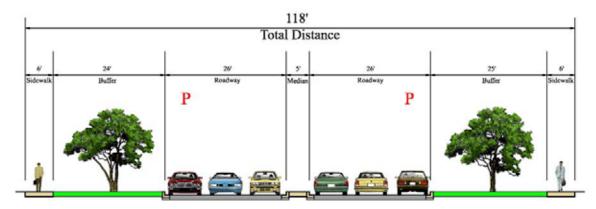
Charles Street/St Paul Street, between Stratford Rd. and Greenway
